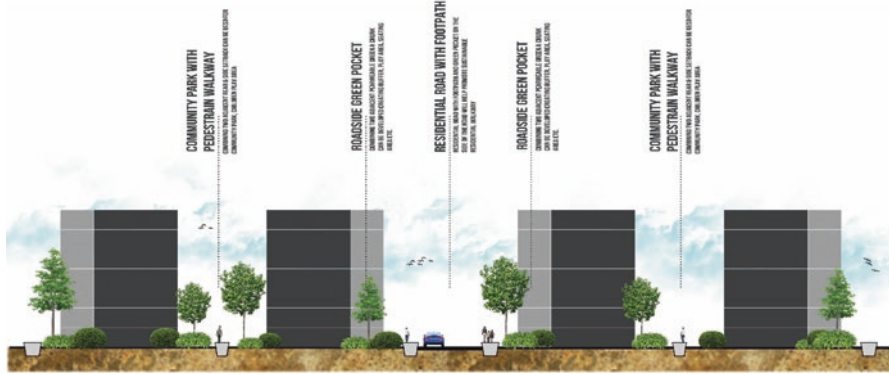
Section (mandatory open space) of proposed building of plot without boundary wall
